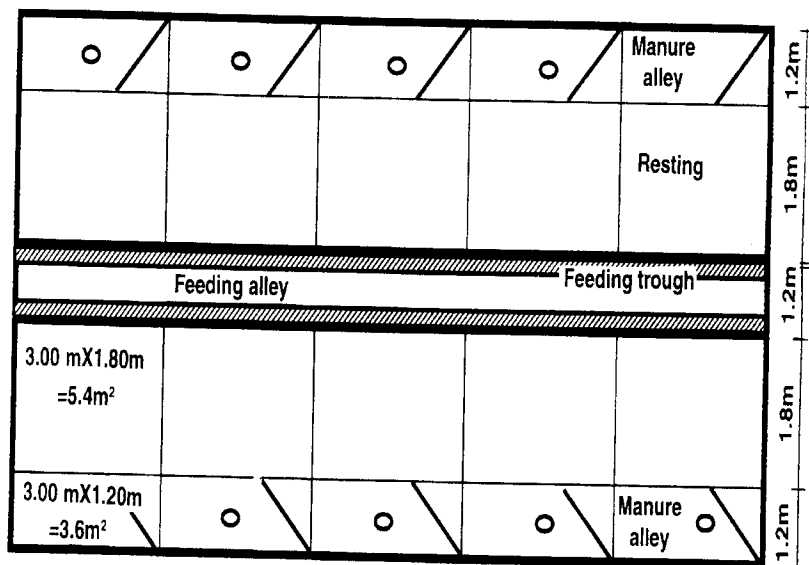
A Layout of Grower/Finisher Plan
